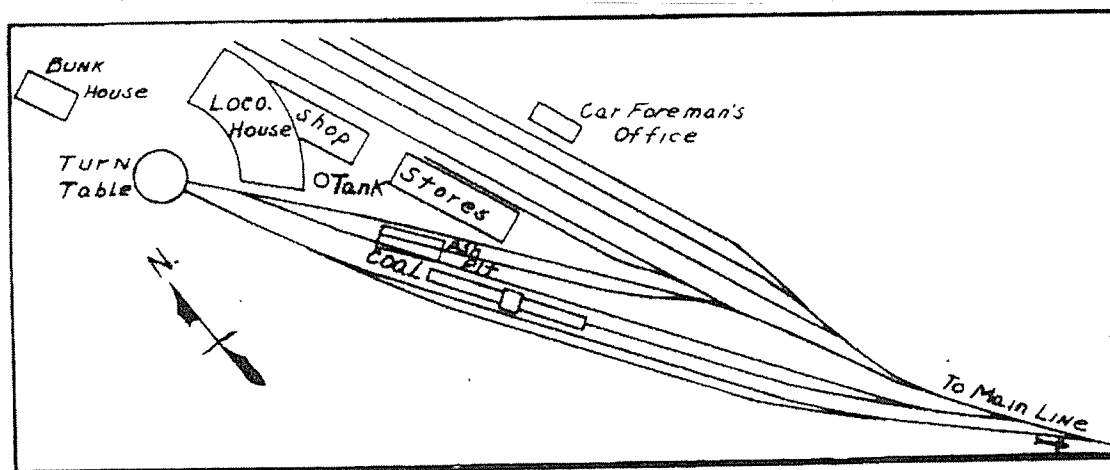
Layout Plan, Canadian National Rys. Terminals, Longue Pointe, Montreal.
